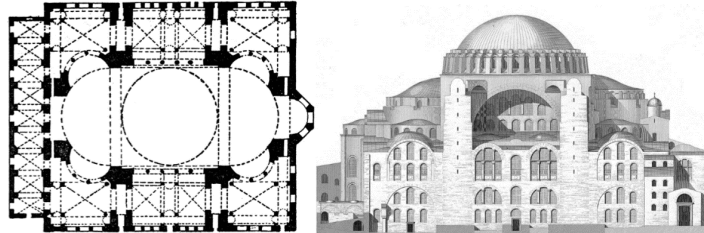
Hagia Sophia, Plan & Elevation (www.hagiasophia.com)
